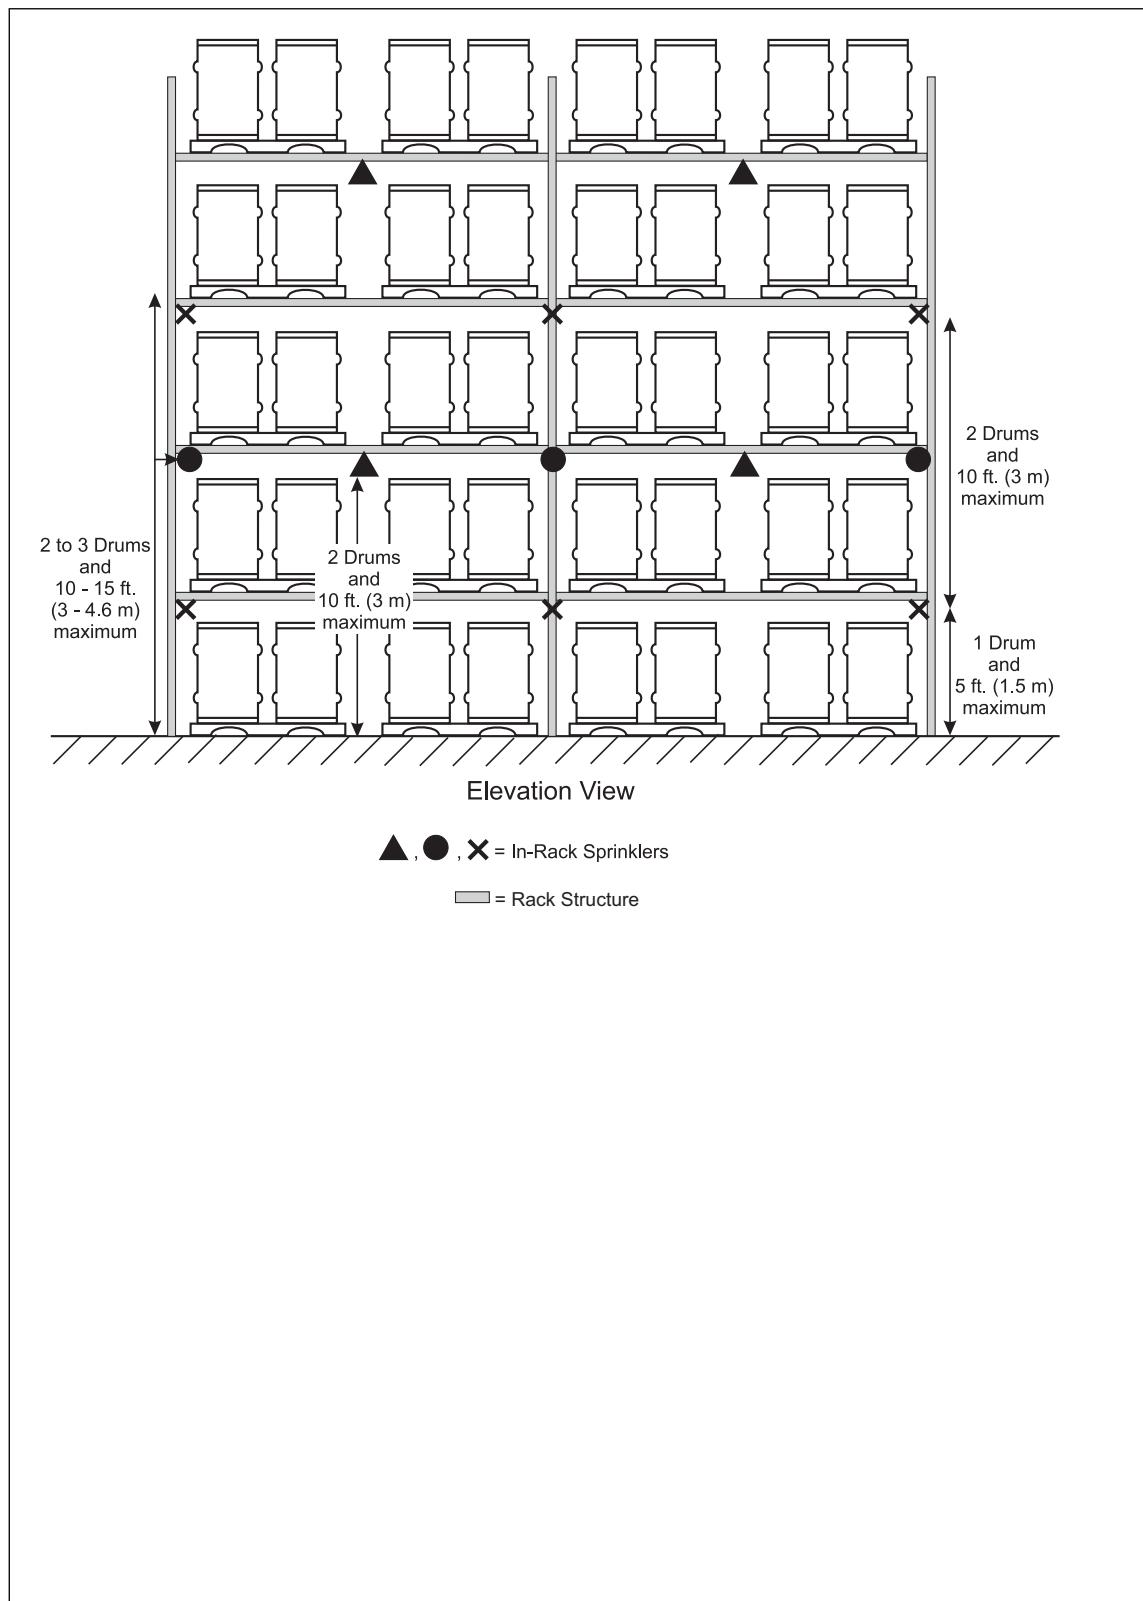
Multiple-row rack sprinkler layout: drum protection scheme (elevation view)
